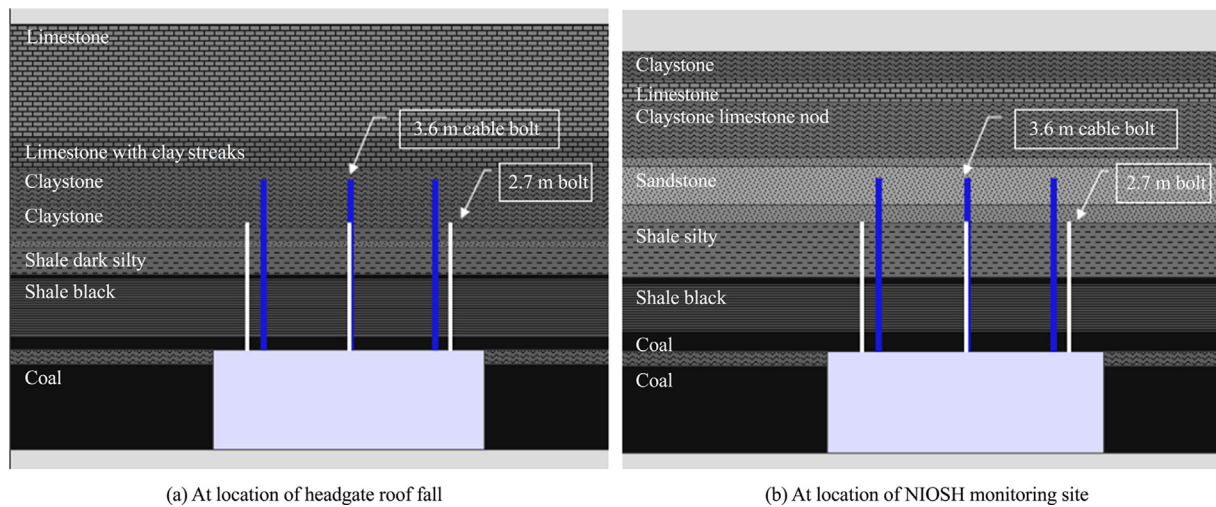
Schematic illustration of roof geology, entry location, and belt entry roof reinforcement. Darker shading indicates lower rock strength.
